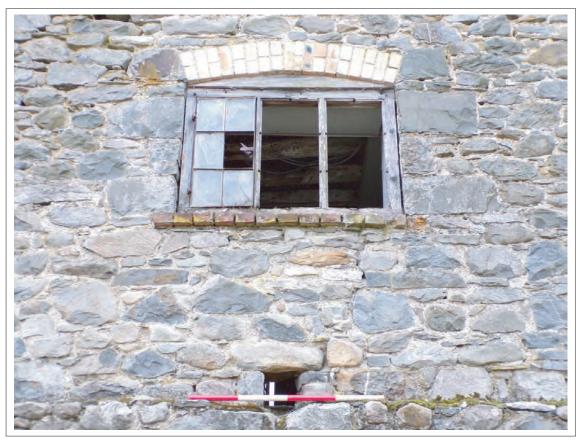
View of window opening within eastern end of southern elevation Scale 1x1m
